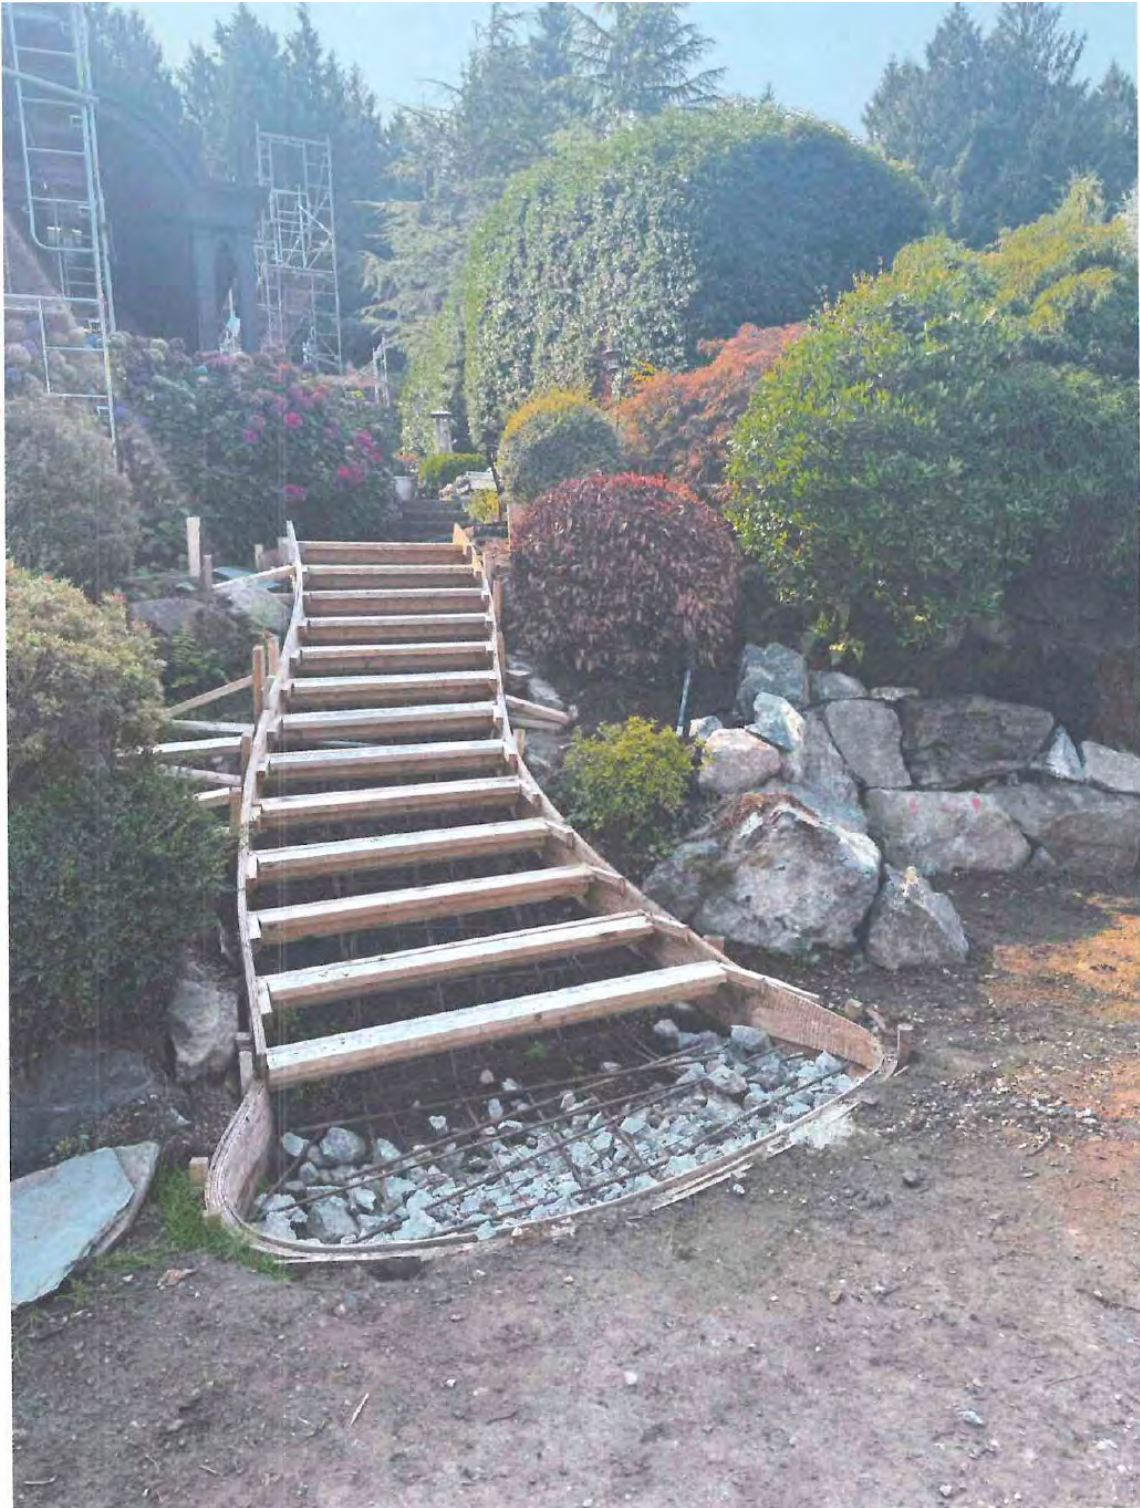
Upper terrace stairs leading to the lawn terrace and then to the stairs leading to the beach.
